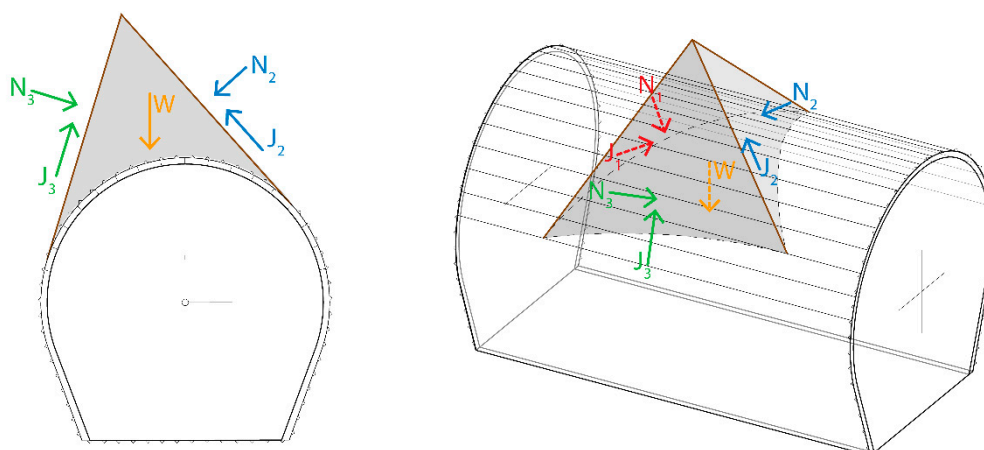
Example of a wedge in two and three dimensions around contour of underground excavation with forces acting on it. N_i —normal component of force; J_i —shear component of force; W —weight of wedge.
